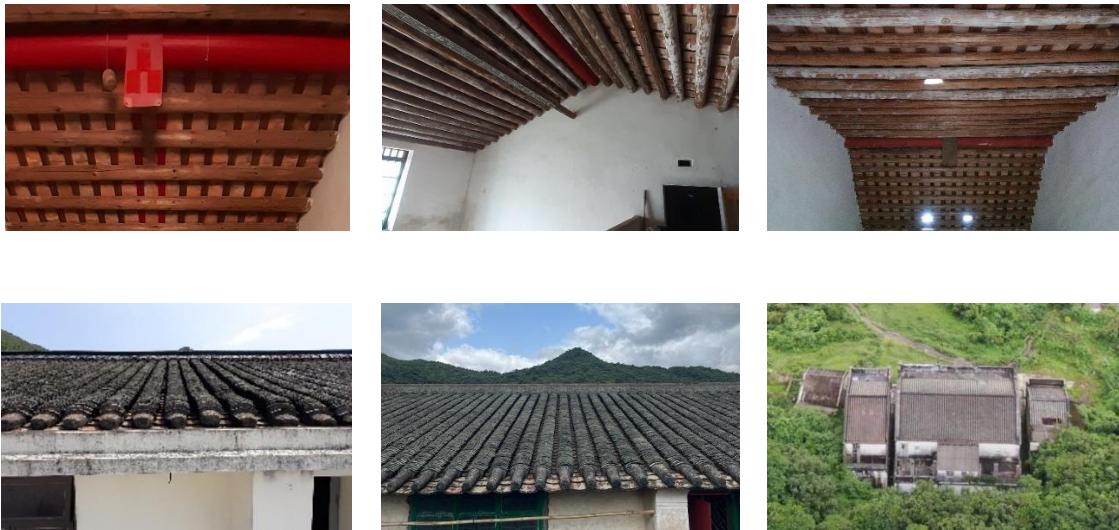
Central beam and 'Hakka roofing' of Ho, Lee, Yeung's Mansion
